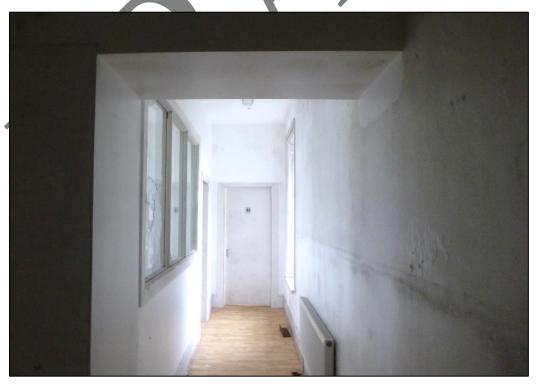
Corridor with later partition wall accessing toilets at NW end of long SW range (18.02.2025).
